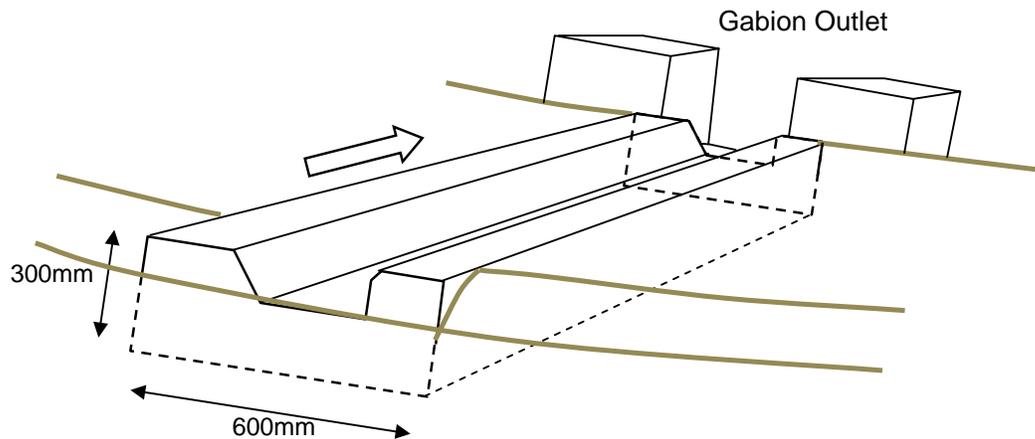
Concrete diversion channel with Gabion Outlet ^[17]
